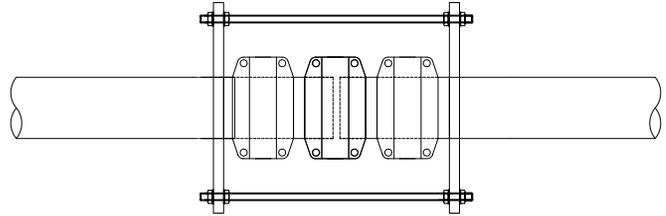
Floating fixpoint devices using two mechanical fitting
